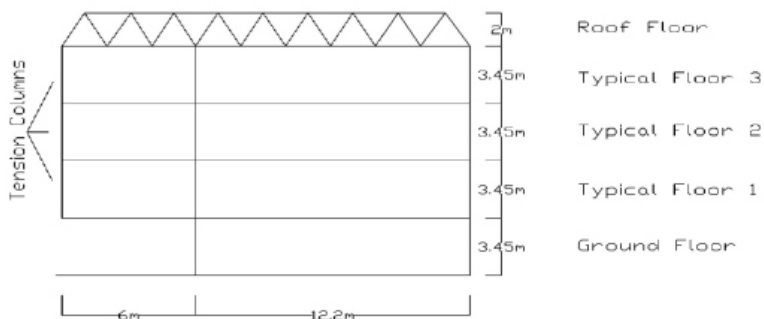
Cantilevered zone section showing tension columns, truss cross-section and 6 m cantilever span
